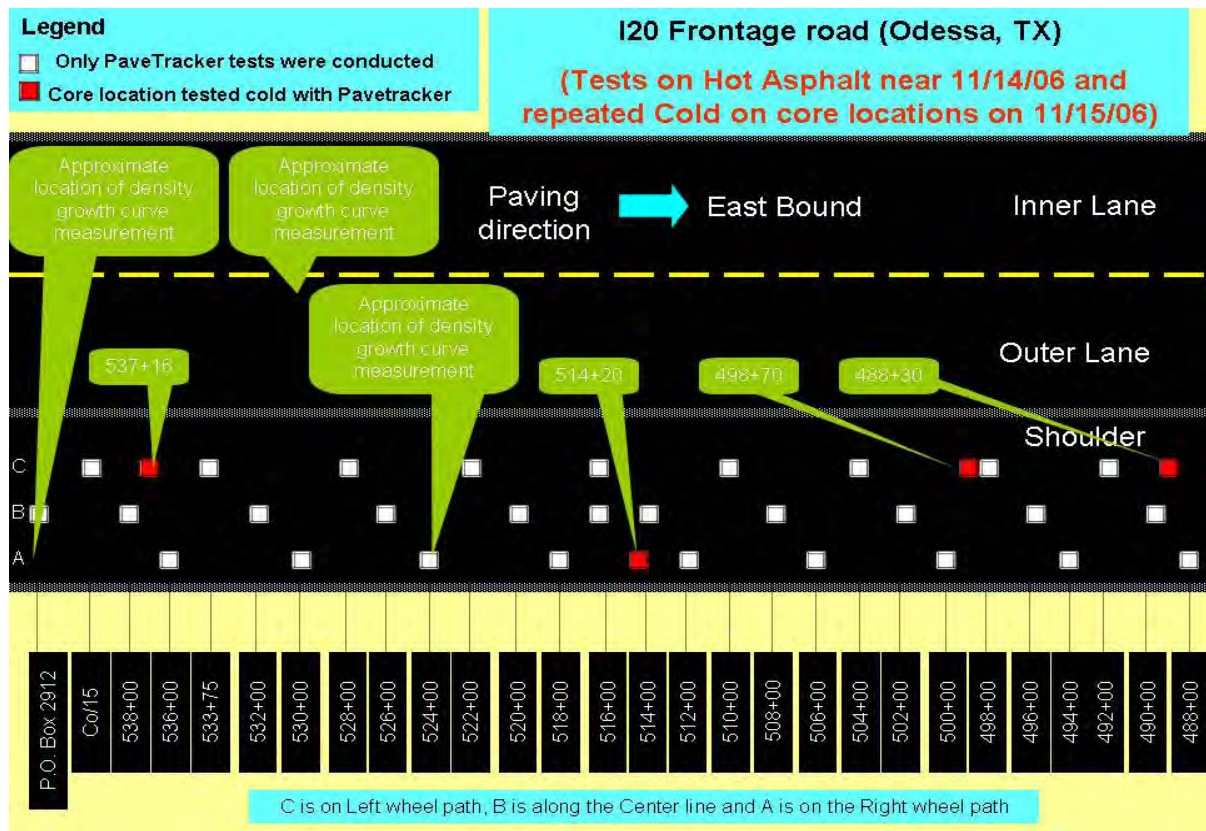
Test Point Layout of Section 1 for HMA Testing Along the I-20 Frontage Road in Odessa, Texas
